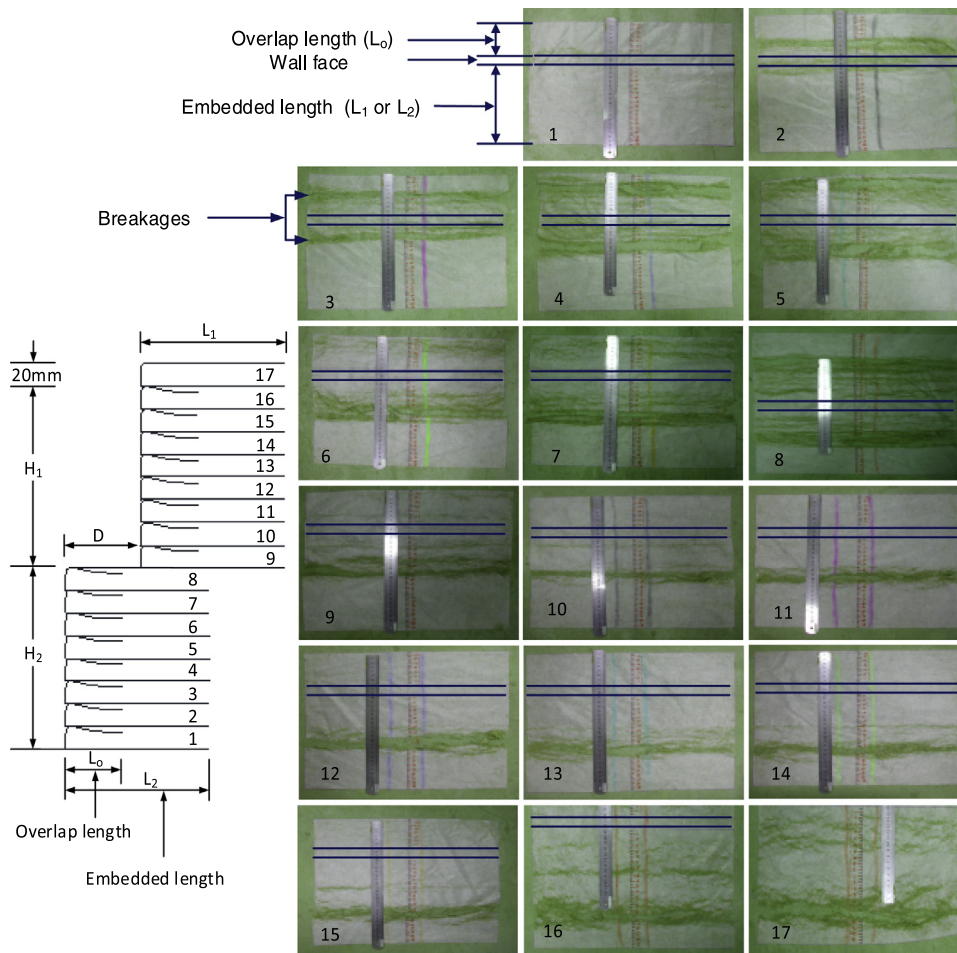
Breakage pattern in reinforcement material after wall failure in Test C5 (numbers indicate reinforcement level from base to top of wall model).
